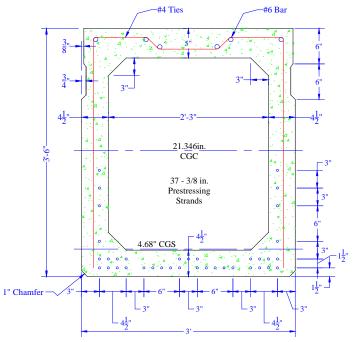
Span 1 Beam 3 of Clearfield Creek Bridge as per Structural Drawings
